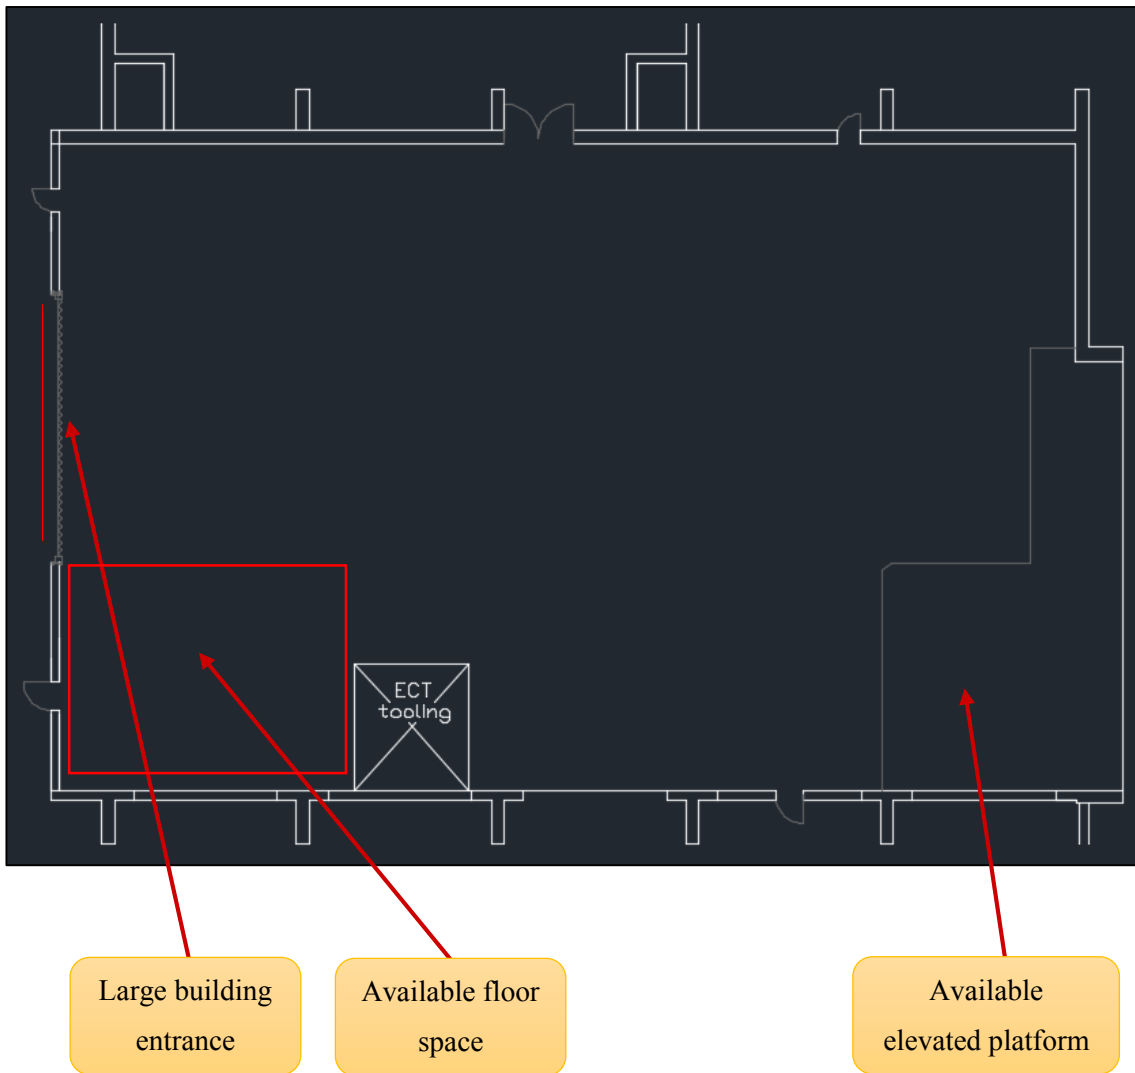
Building 191 floor plan (Sinclair & ATLAS, 2015).
